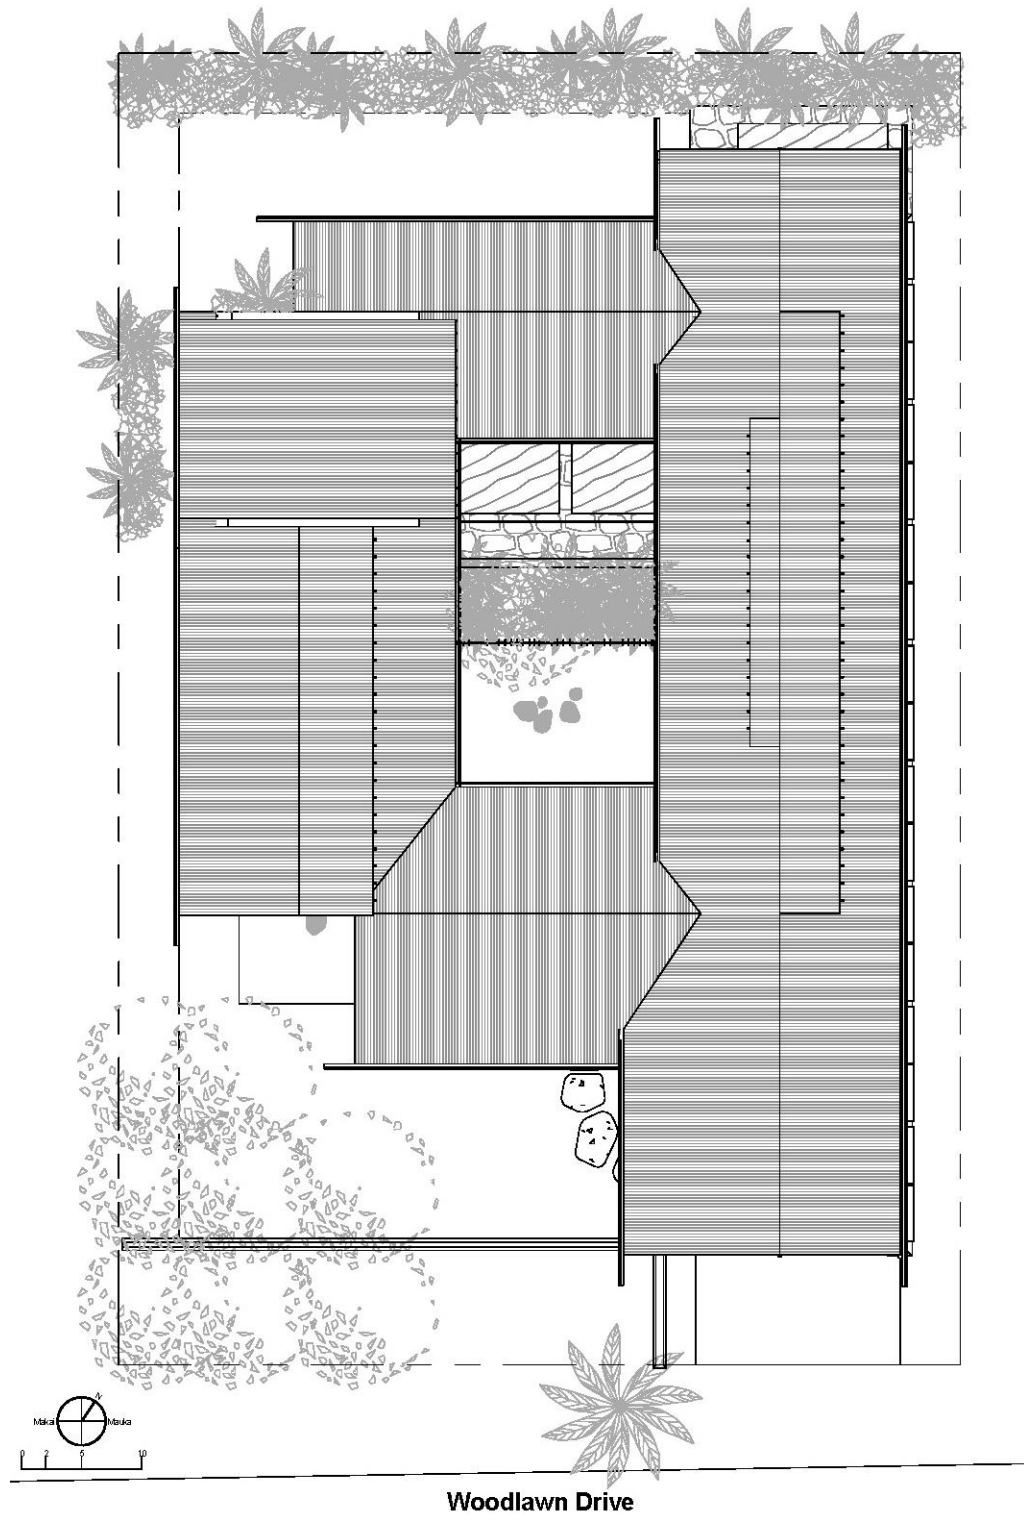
Project A, Roof Plan. Scale: 1/16" = 1'-0"
